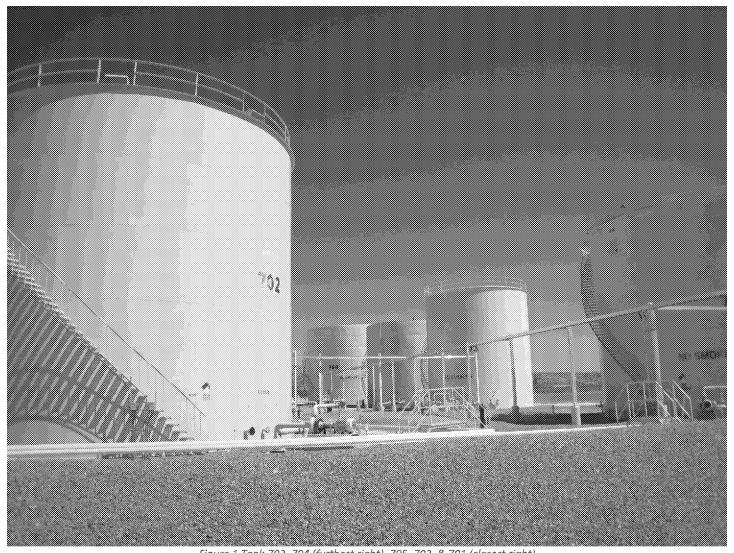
Tank 702, 704 (furthest right), 705, 703, & 701 (closest right)
